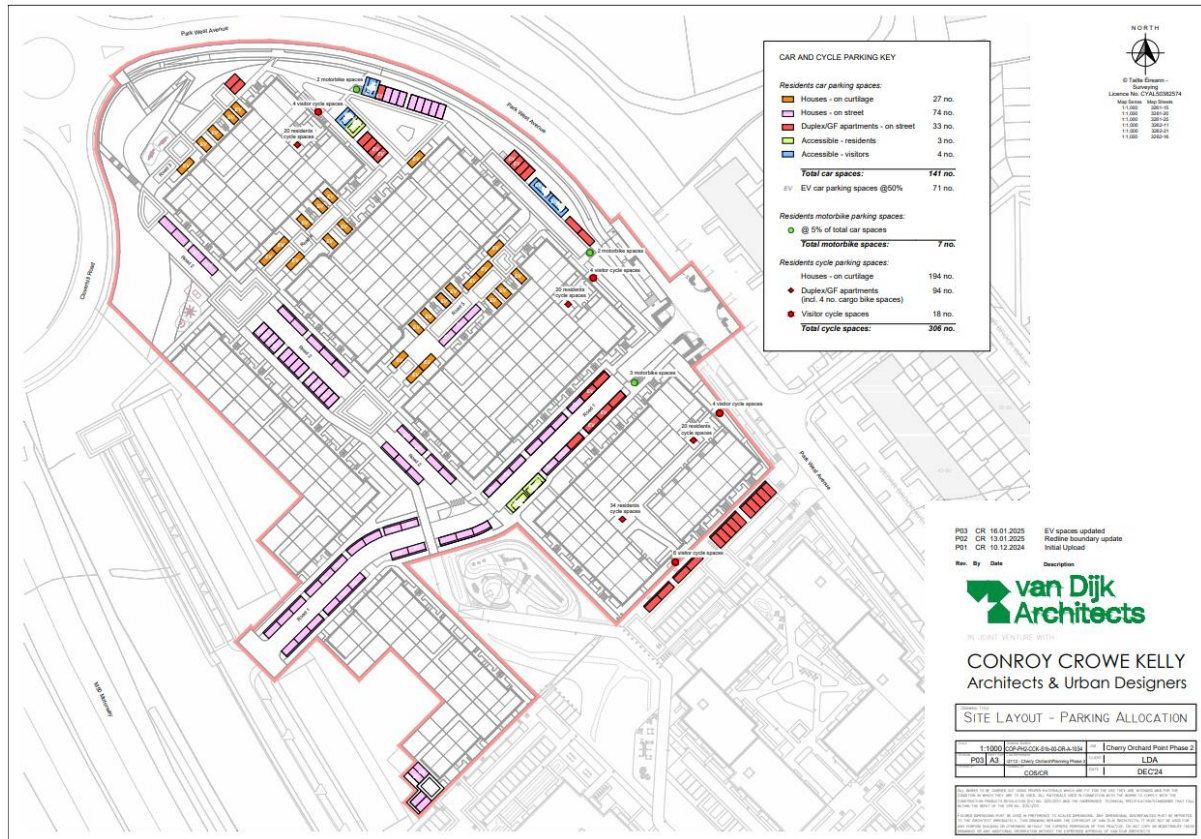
Car Parking Layout Plan (Source: Van Dijk Architects and Conroy Crowe Kelly Architects)
